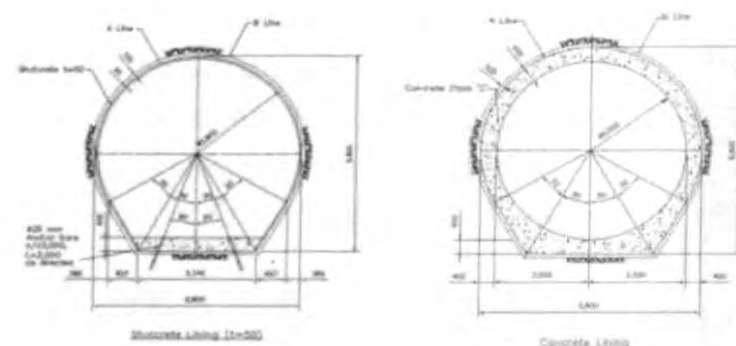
Un-lined and Concrete Lined Sections of Headrace Tunnel
